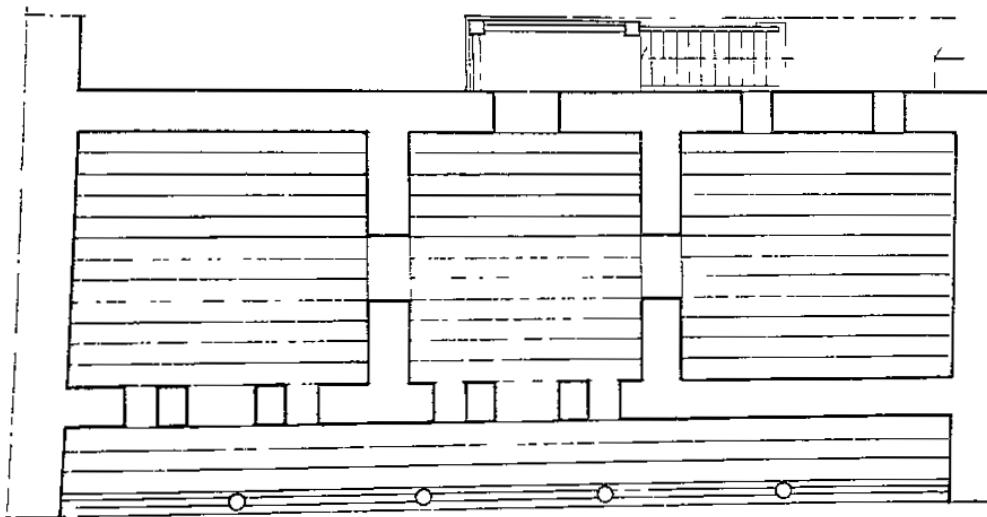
Rome, Forum, reconstructed ground plan of building over the Sepulcretum.
